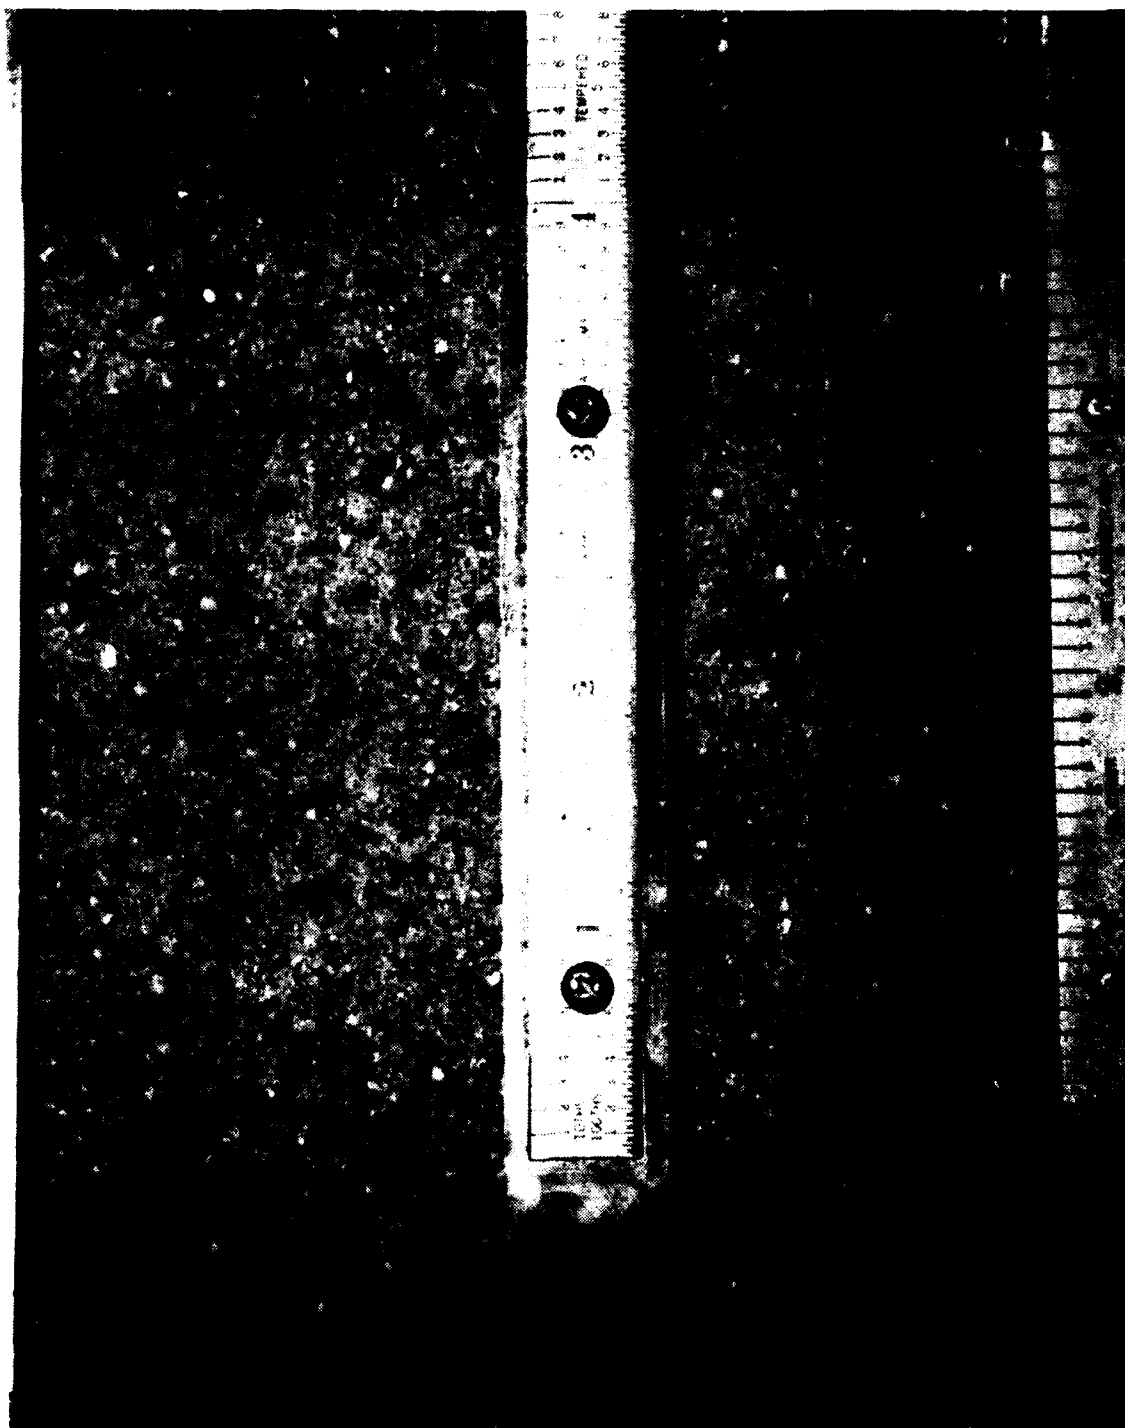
RUNWAY 0, A BURLAP DRAGGED PORTLAND CEMENT CONCRETE
